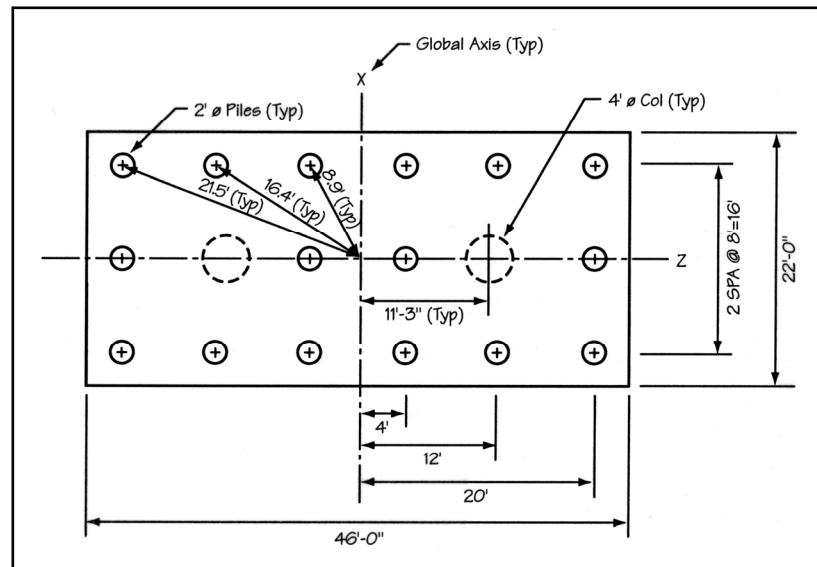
Plan View of Typical Intermediate Bent Pile Cap
